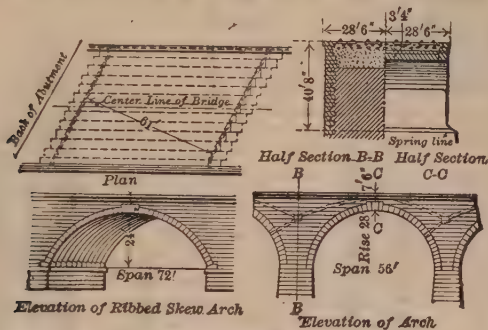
Railroad Bridge, New Brunswick, N.J.
